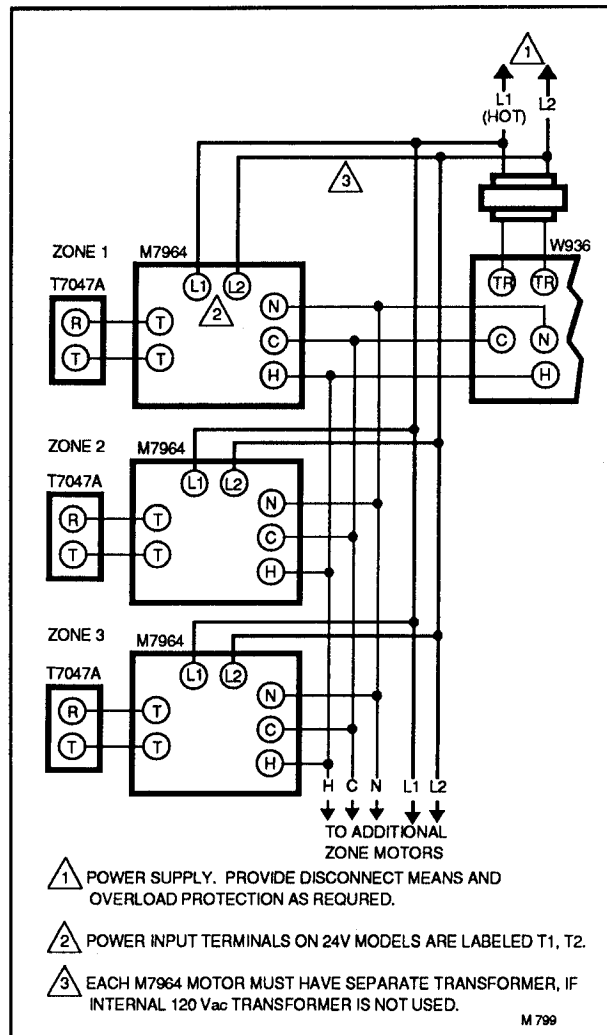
CONNECTIONS FOR THE M7964B,C MODUTROL MOTORS WITHOUT PLUG-IN CONNECTORS.
